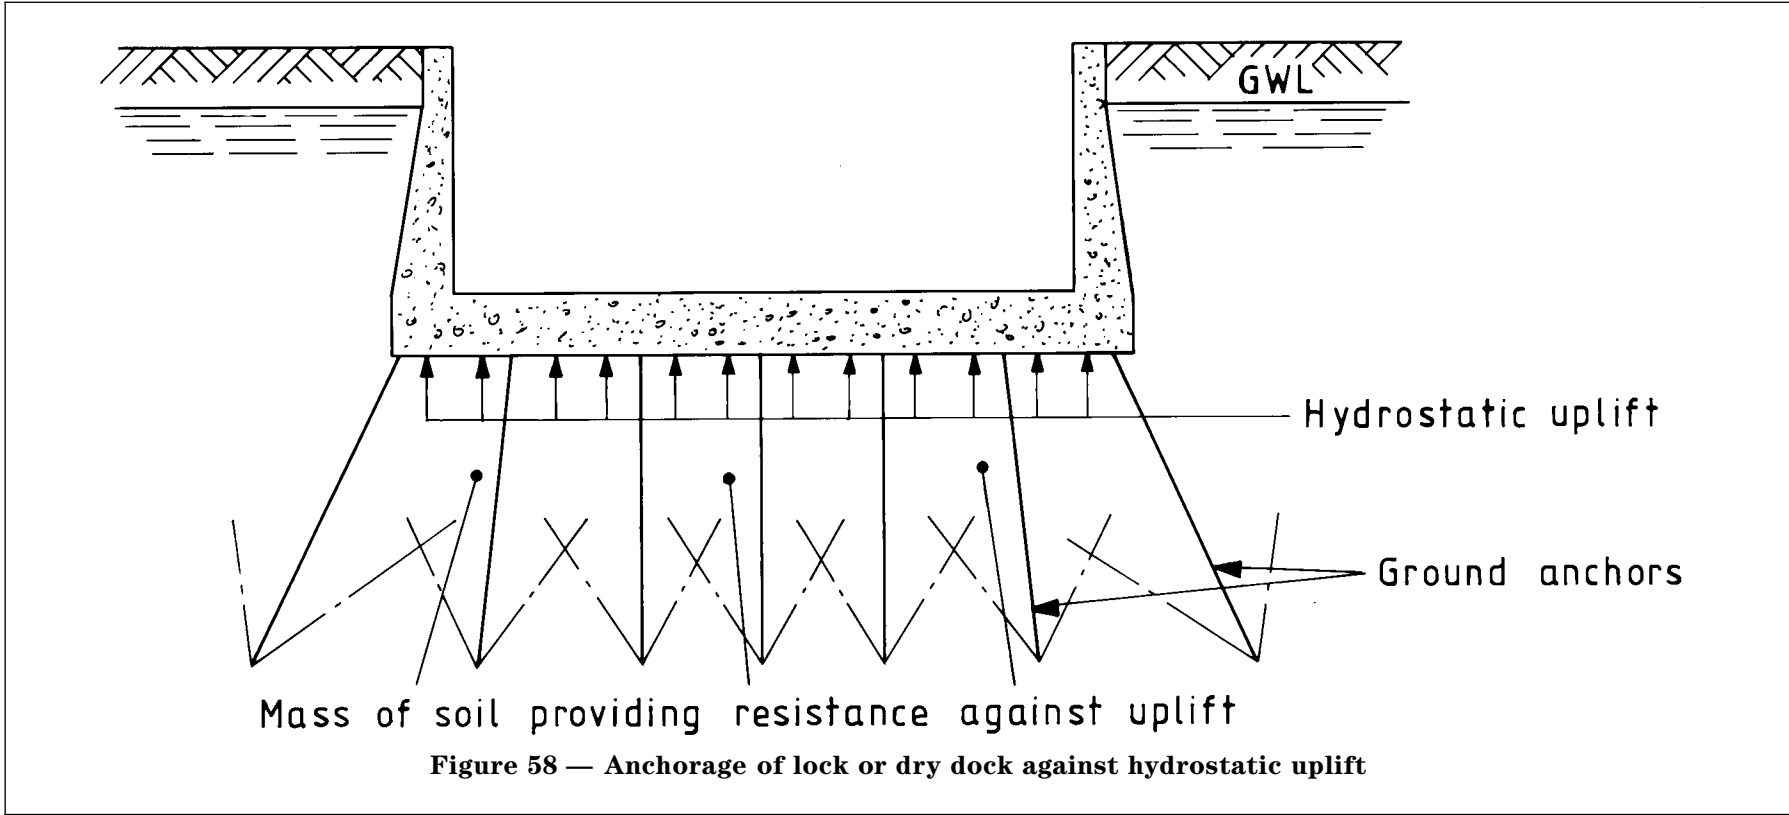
Anchorage of lock or dry dock against hydrostatic uplift
